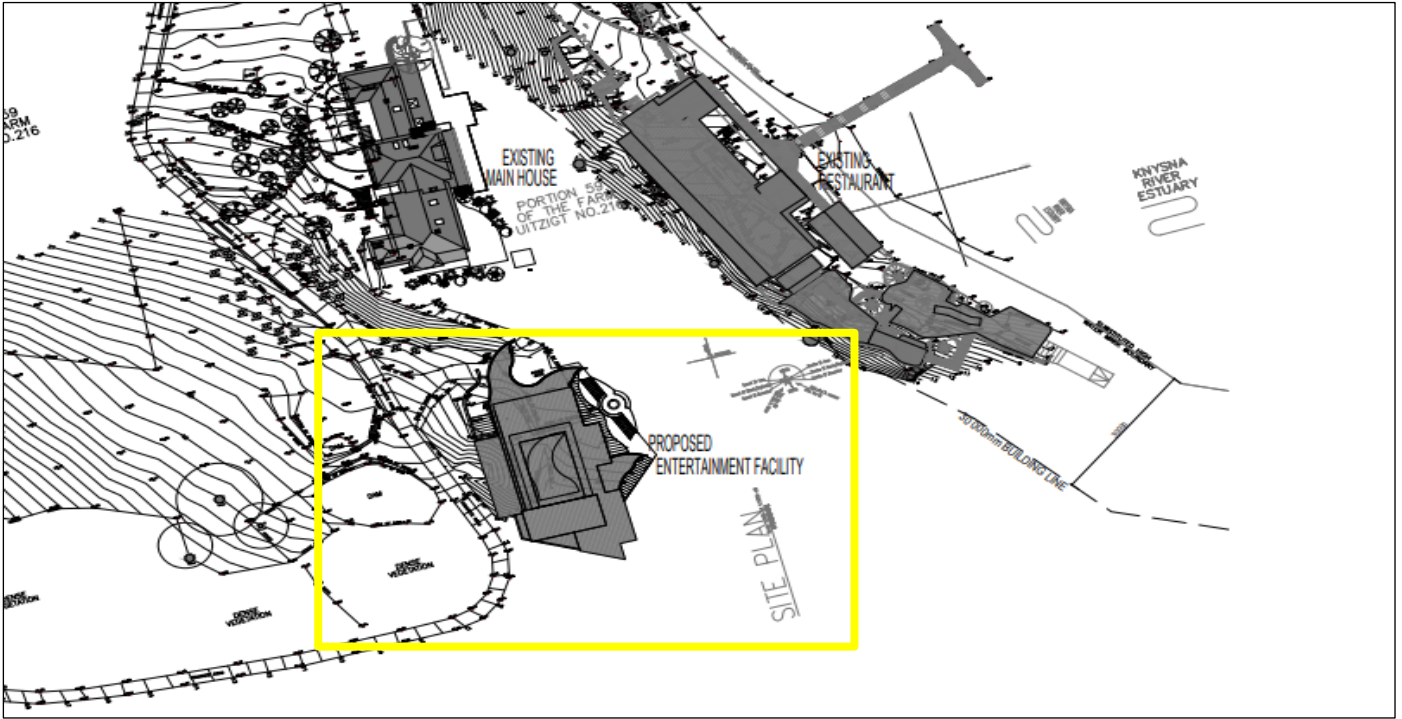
Proposed Entertainment facility (TMBA, 2024)
